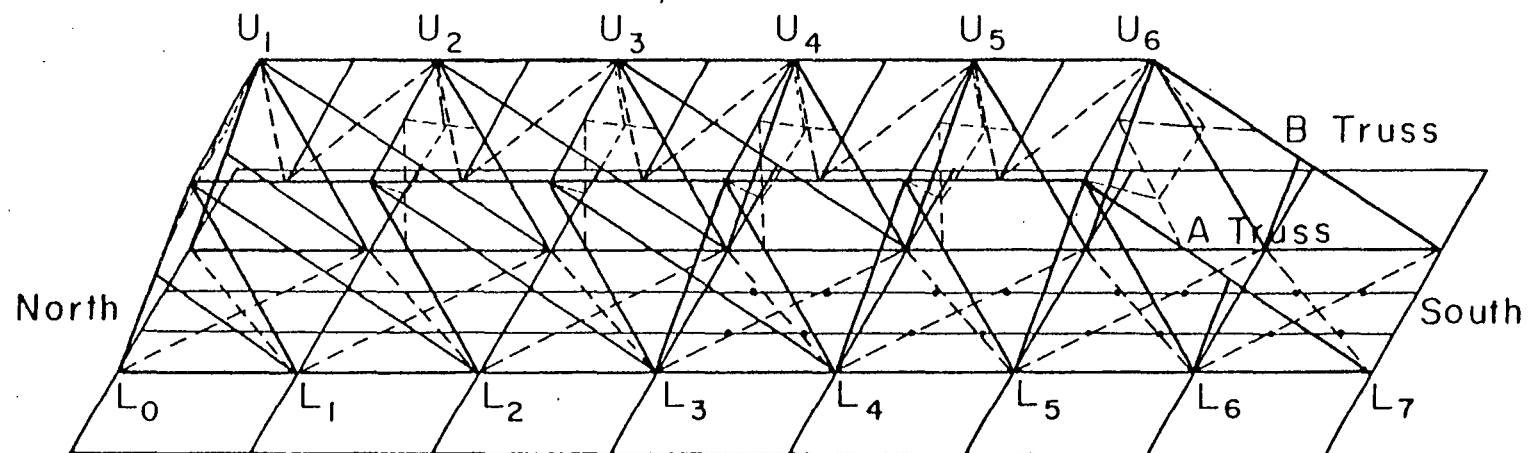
Three-Dimensional Space Frame Model of Kosti Bridge in Sudan Railway
